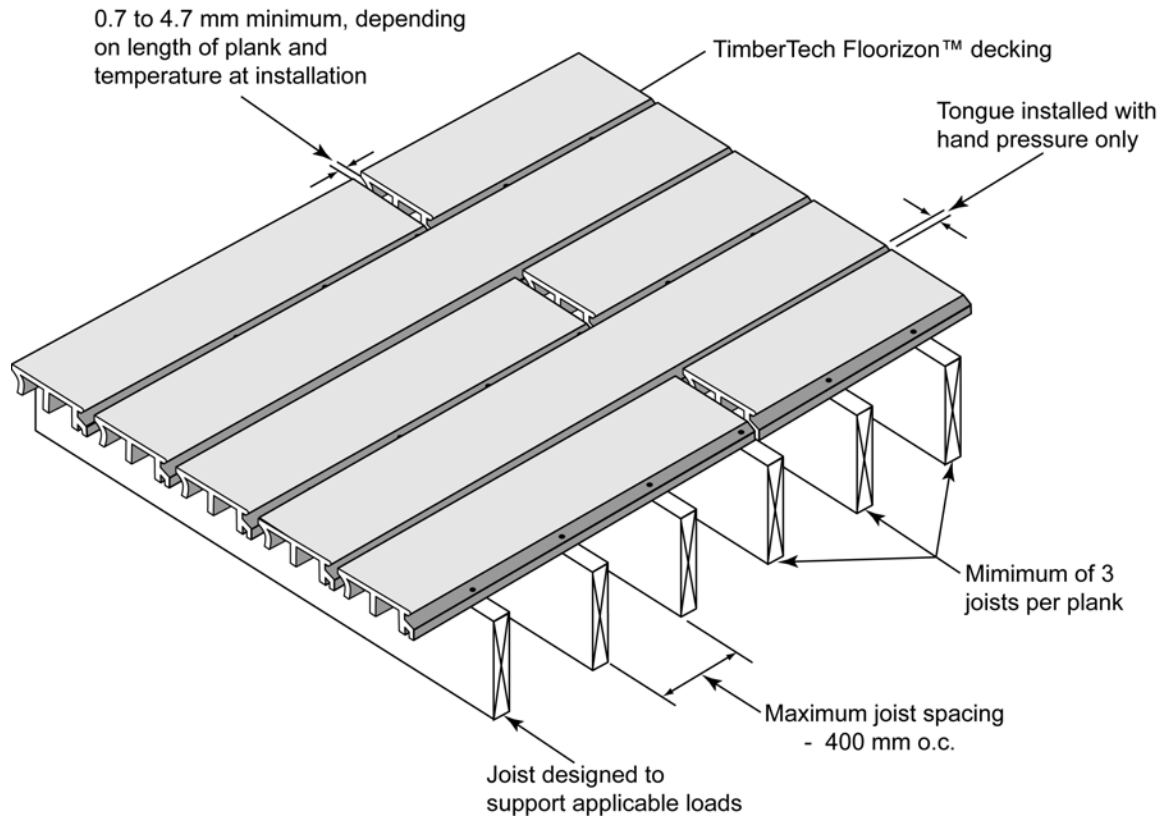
Installation details for “TimberTech® Profiled Decking – Floorizon™.”
